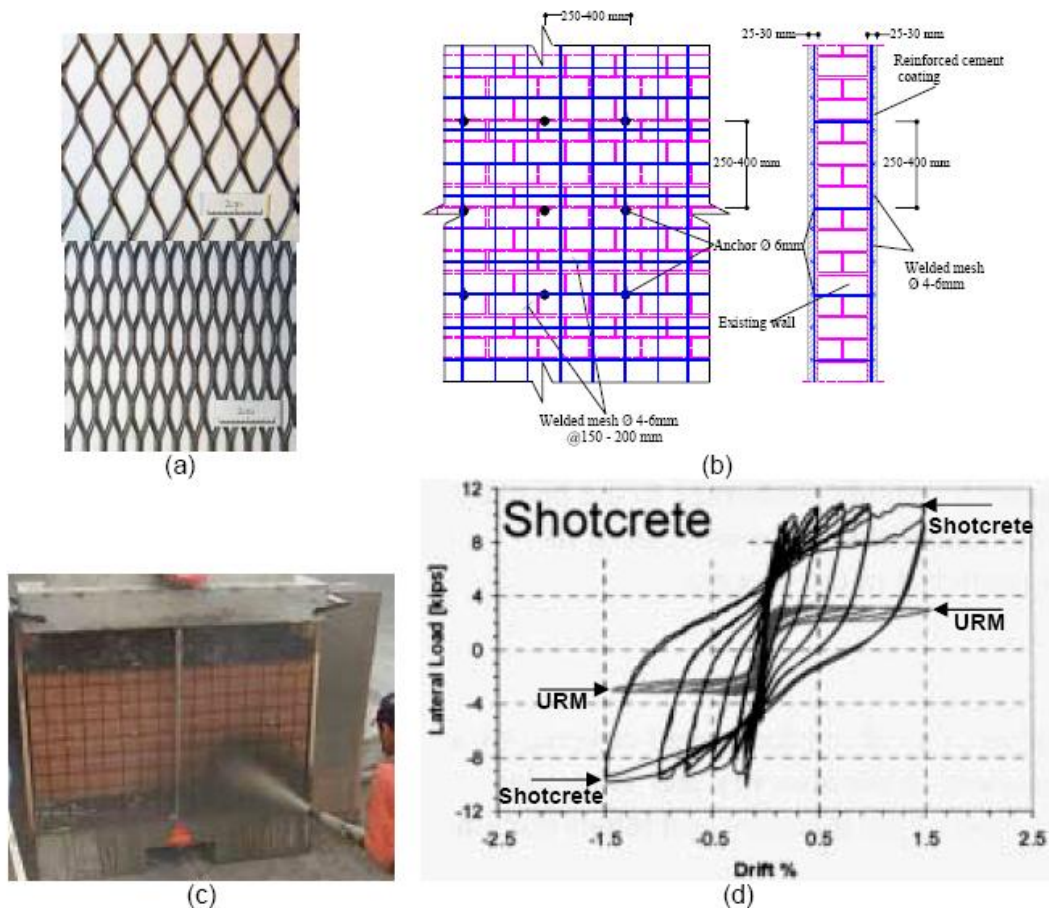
Surface treatment: (a) hardware samples used in ferrocement (TWP Inc.), (b) reinforced plaster typical dimensions, (c) application of shotcrete for test specimen (ElGawady et al. 2004), and (d) hysteretic curves for a specimen before and after retrofit using shotcrete (Abrams and Lynch 2001)
